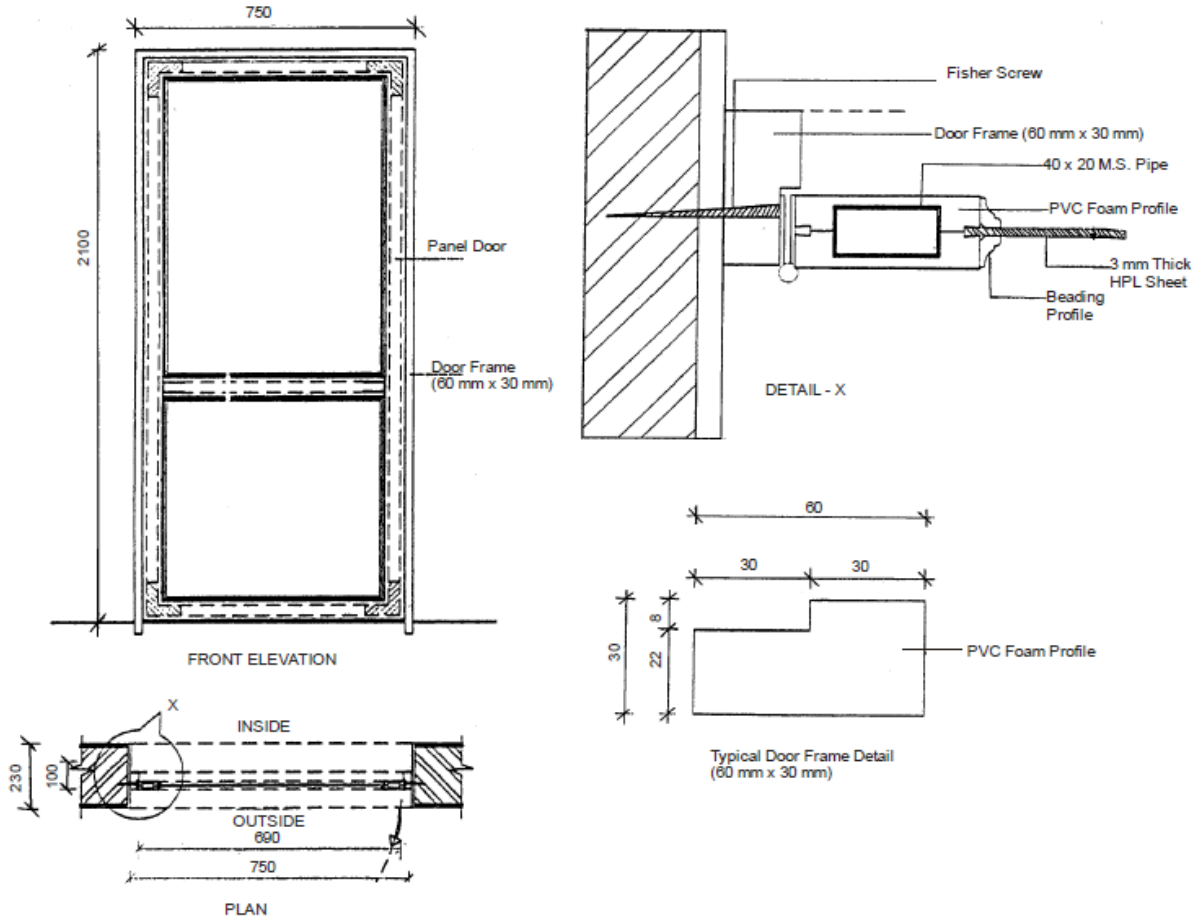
B : Sketch Illustrating Dimensions of Shutter
